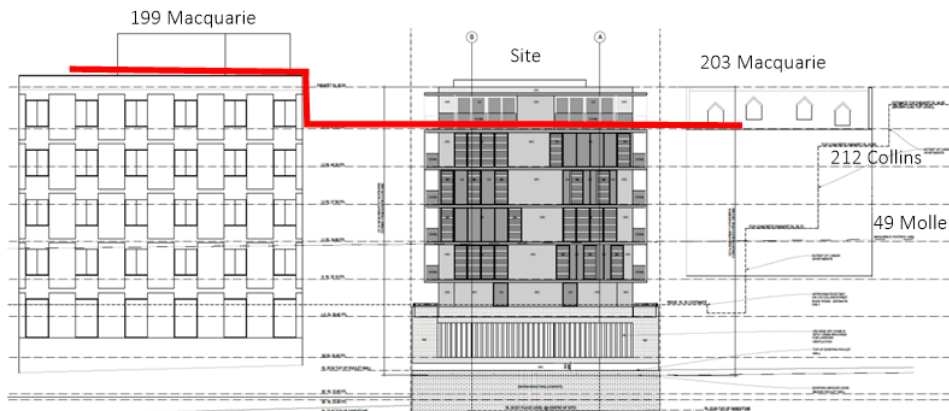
Hobart Rivulet elevation depicting transition in height between adjoining buildings and proposed development (source: Rosevear Stephenson)
